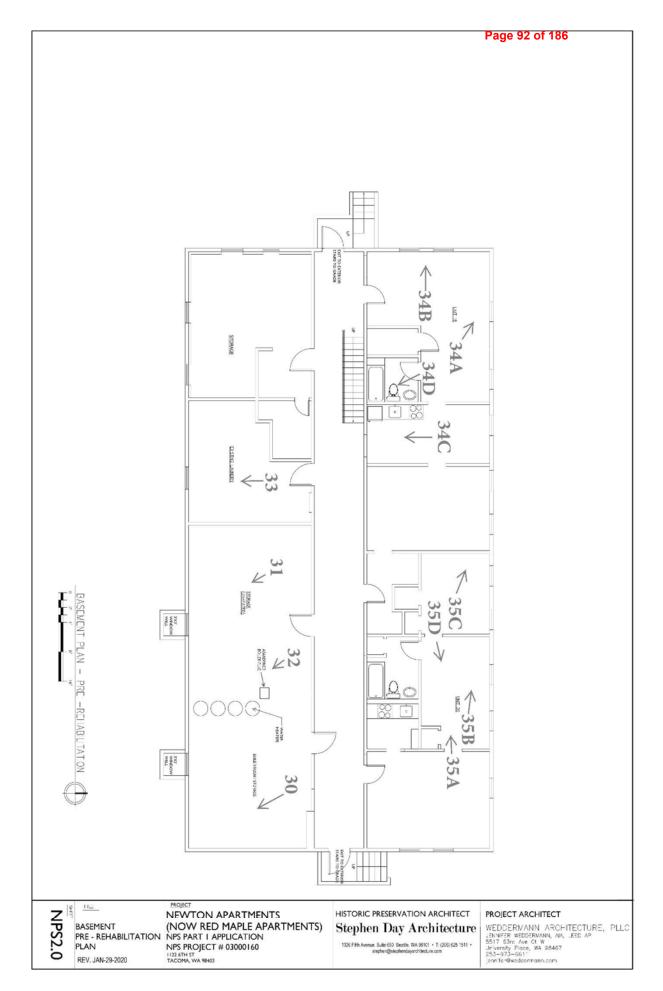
A. Newton Apartments, Basement Plan – Pre-Rehabilitation, Photograph Key Plan.
